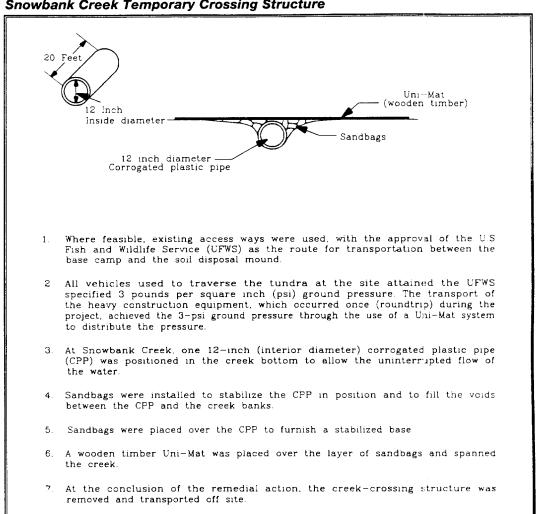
Snowbank Creek Temporary Crossing Structure
